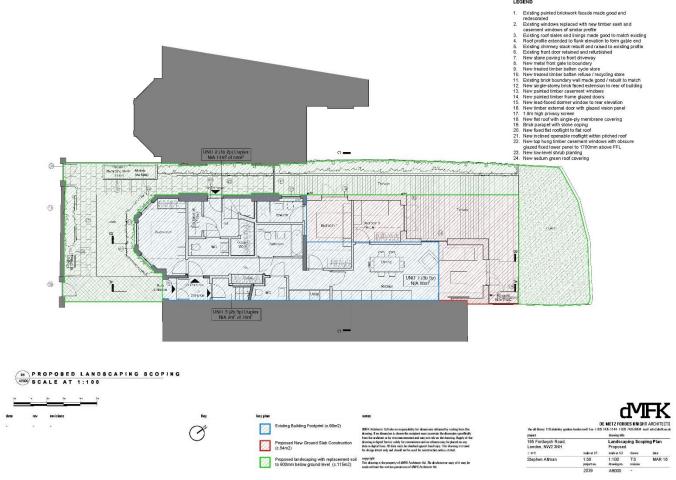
Extract from drawing dMFK_2039_A8000 showing the extents of existing building, new concrete ground bearing slab and external landscaping.
